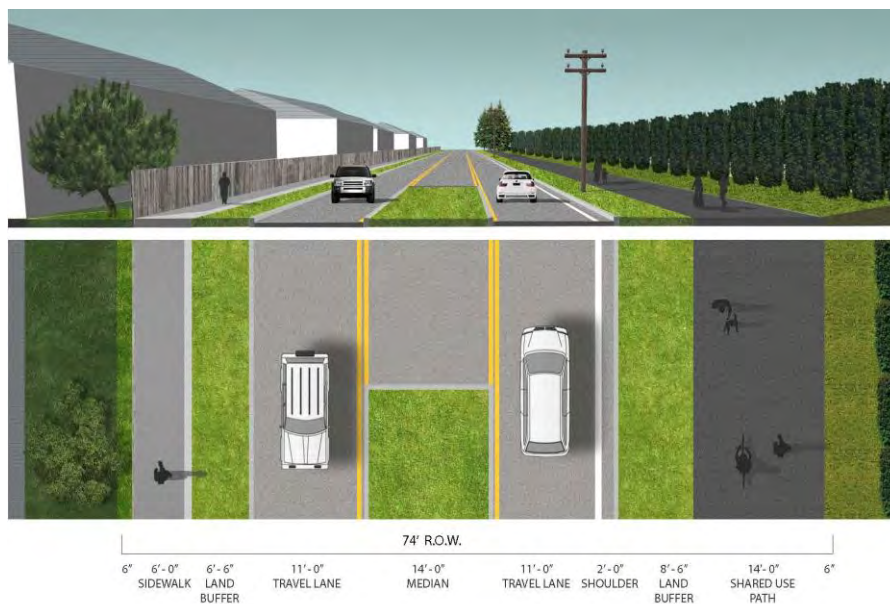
Looking toward the north, a trail route along the east side of SE 282nd Avenue was adopted as part in the Gresham Trails Master Plan.
